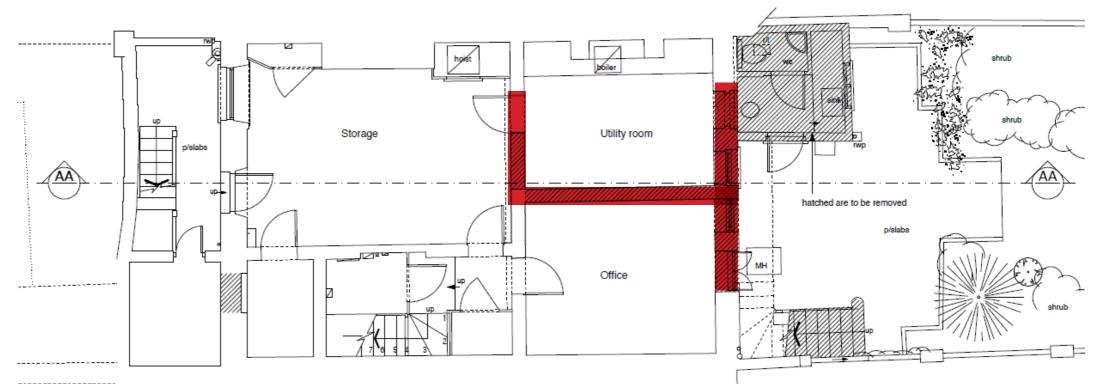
30 Belsize Grove Existing lower ground floor plan
